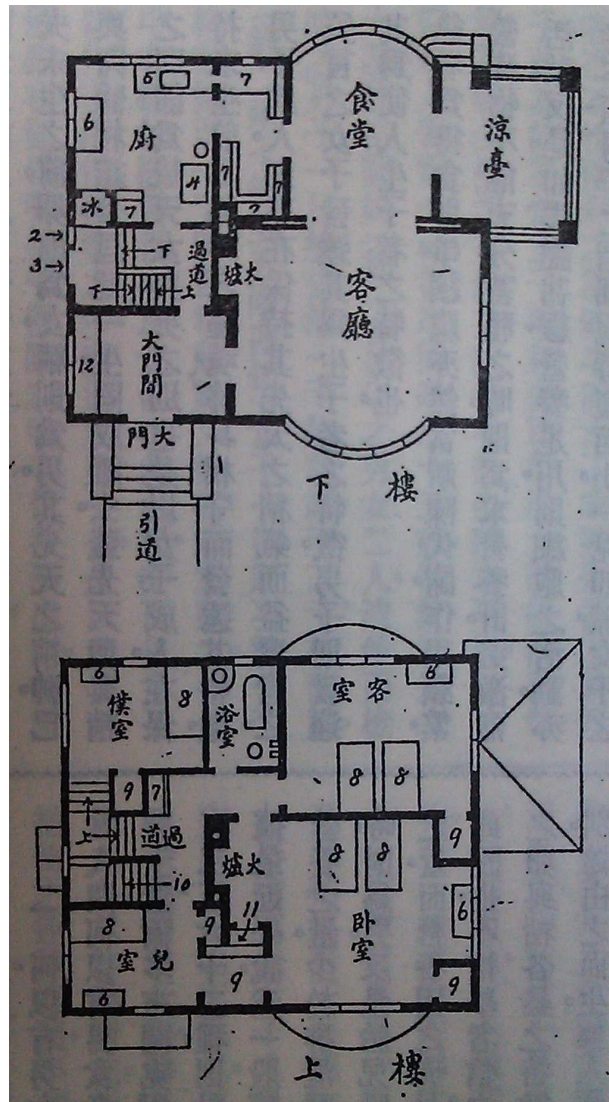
"The Western house," ground floor (top) and upper floor (below) plans, taken from an unspecified American newspaper
